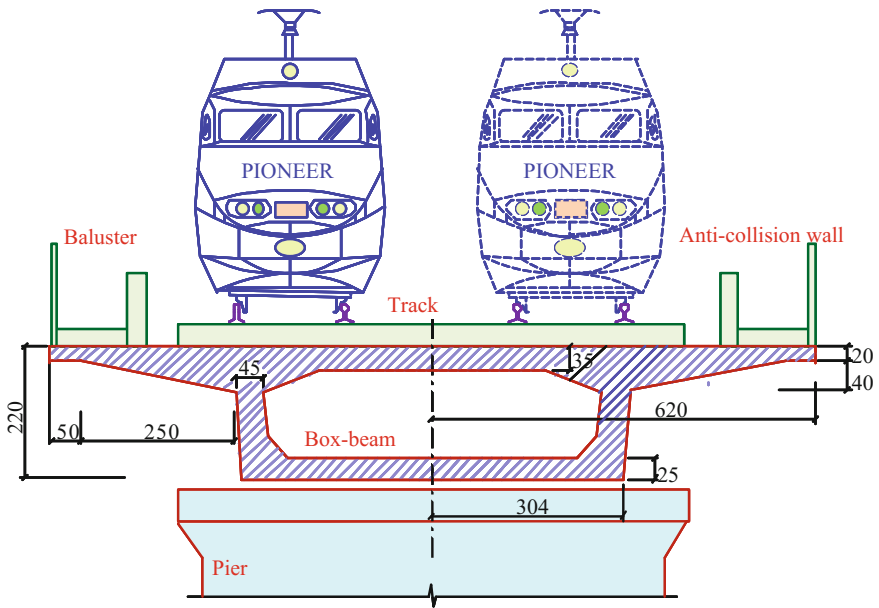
Cross section of the 24 m-span PC box-beam (Unit: cm)
